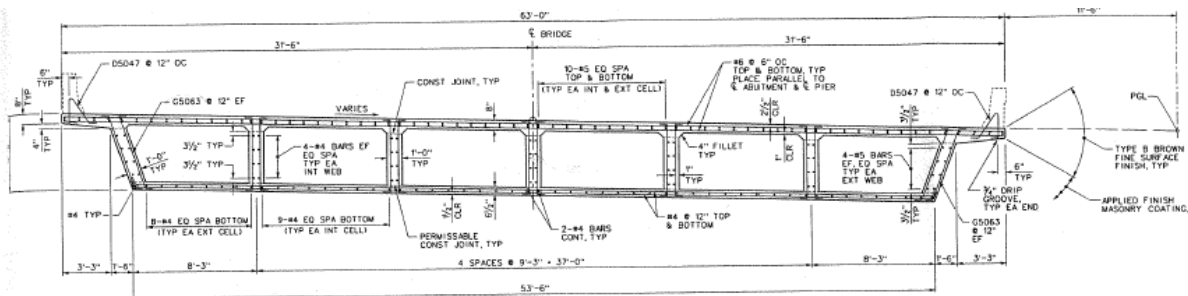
Girder Cross-Section (BERGER/ABAM)
